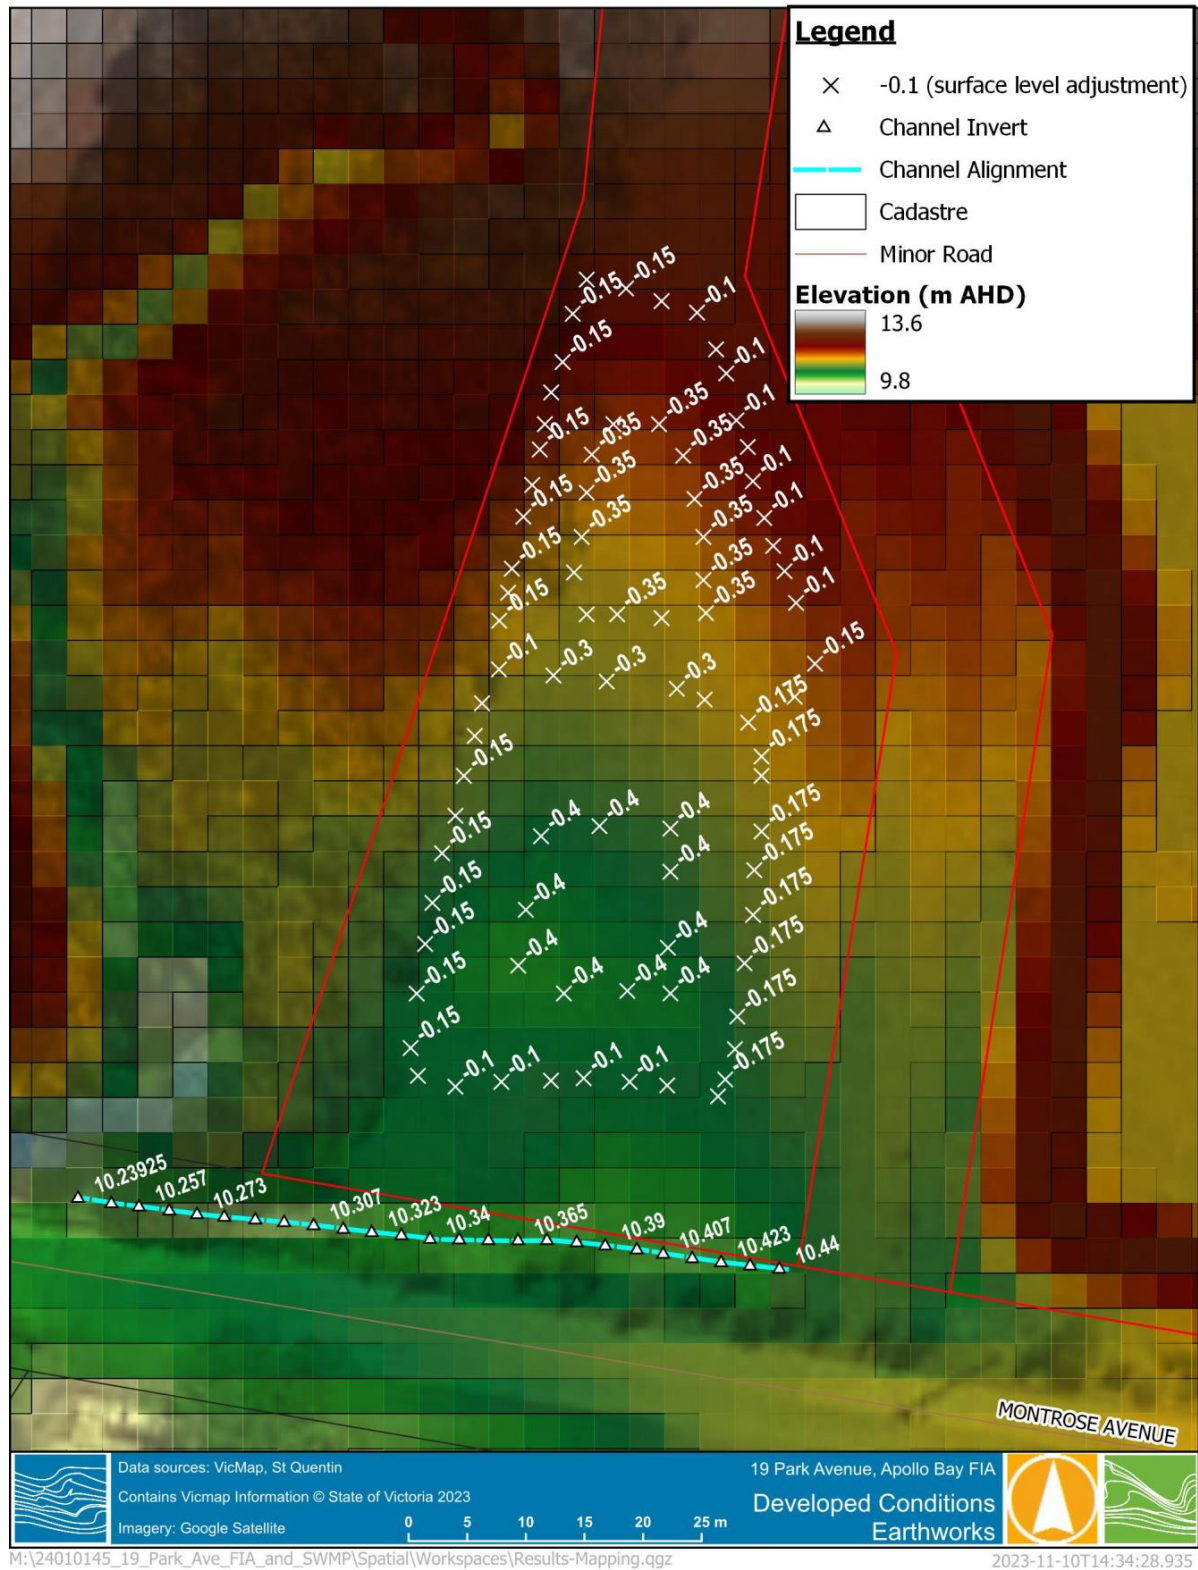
Proposed Developed Floodplain Storage Works & Open Channel
